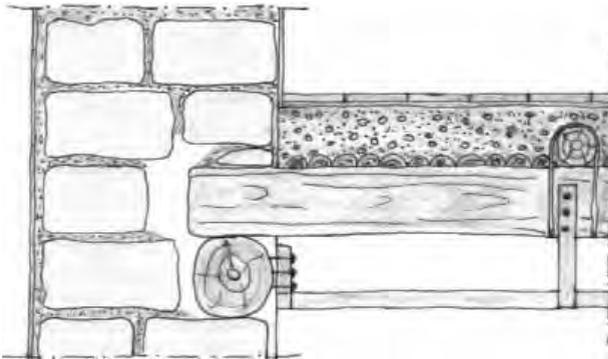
Detail of a floor slab with the use of ginelle bastarde.
